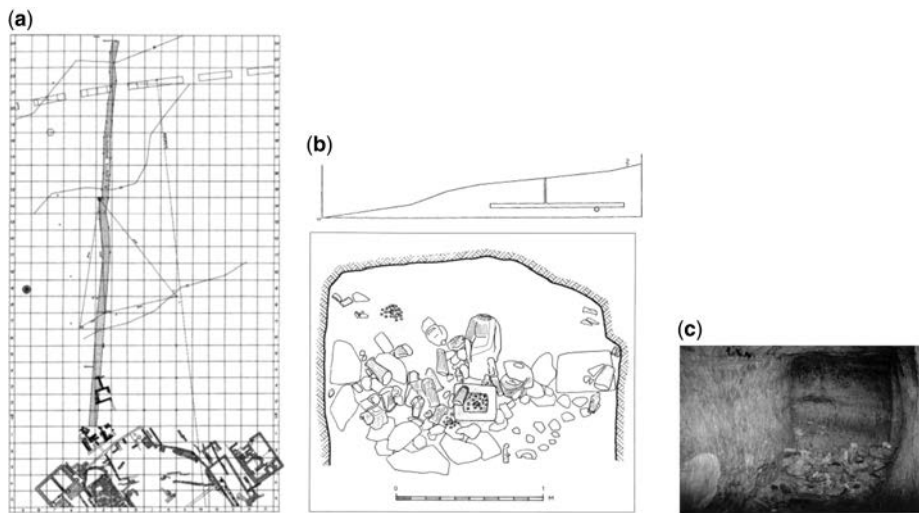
The Underground Nymphaeum of Amathus, Ancient Tunnel: (a) Plan, (b) Longitudinal Section (upper) and Cross section (down), and (c) Photo (From the Department of Antiquities with permission)
